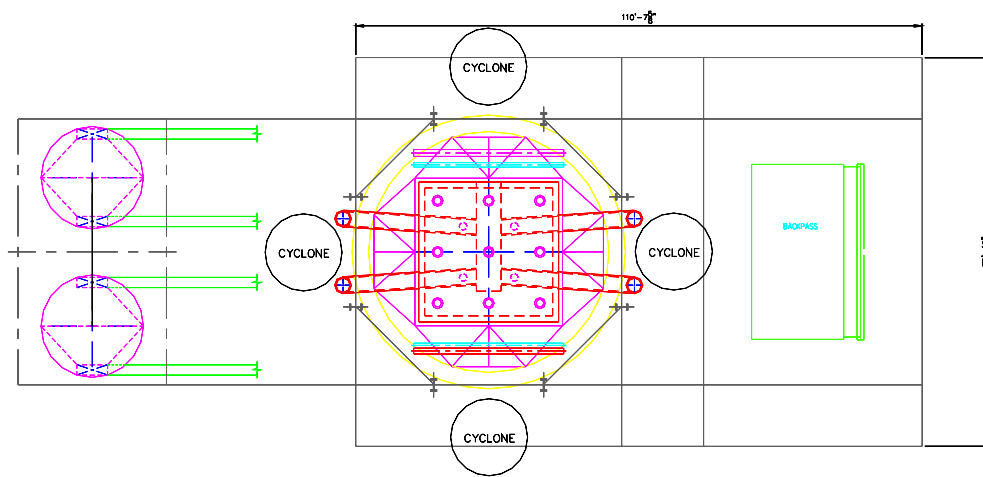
5: CMB™ Combustor General Arrangement Drawing (Plan View)
